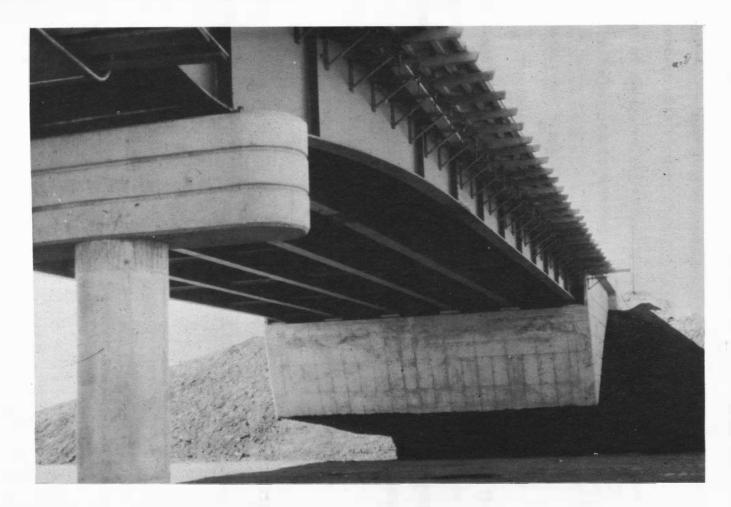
Shallow Construction Bracket Mounted on Deep Web
